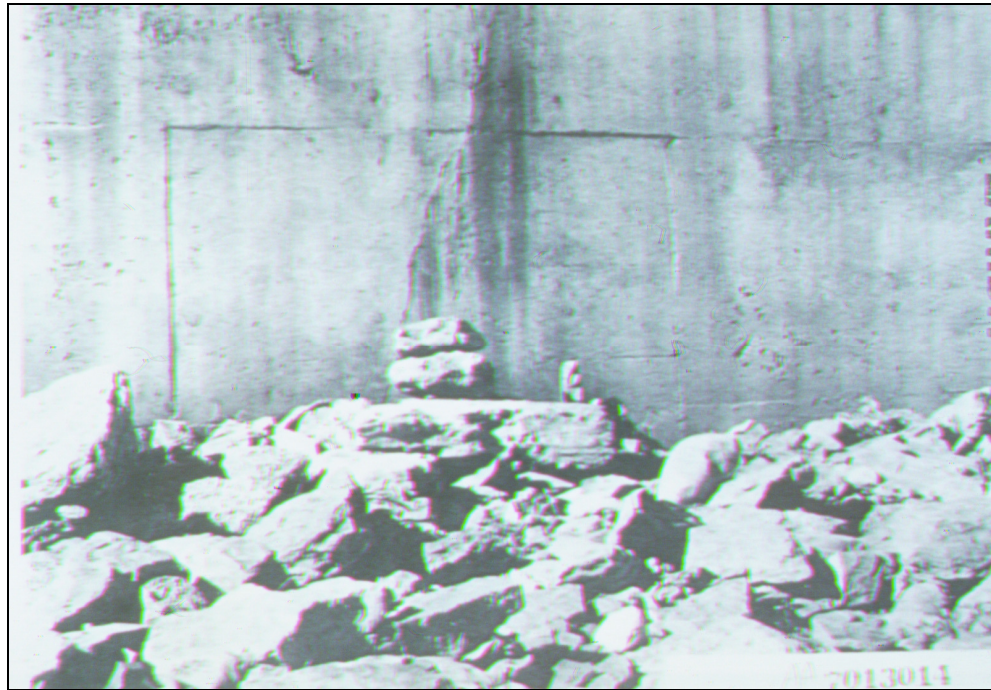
Photograph of riprap at pier 2, October 1956.
